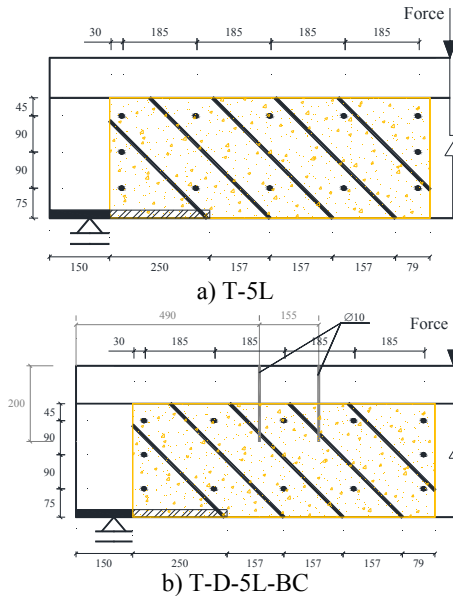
Shear strengthening details for tested beams (dimensions in mm)
